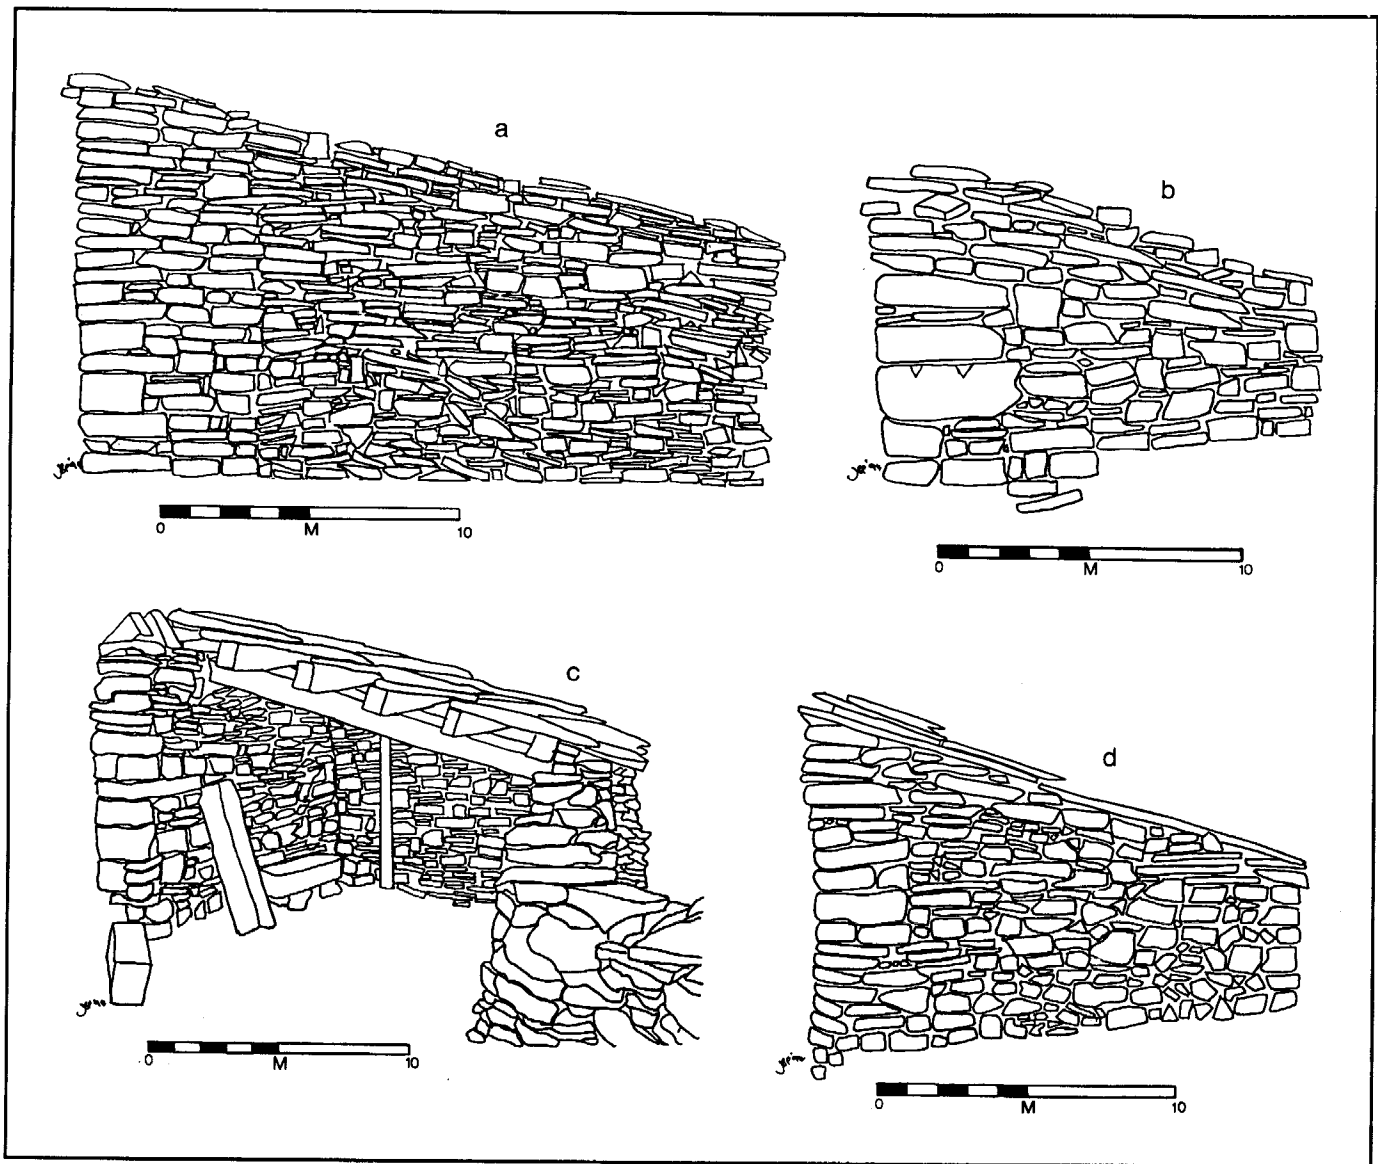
(a). Blacklands. Elevation of north wall showing different size stone used in modern addition. (b) Mr Meets's. Elevation of west wall of quarr house, showing wedge marks. (c) Acton Field. Elevation of quarr house south wall. Note the shaped stones used on the front corner. (d) Court Pound. south side of quarr house A, showing the controversial roof.
